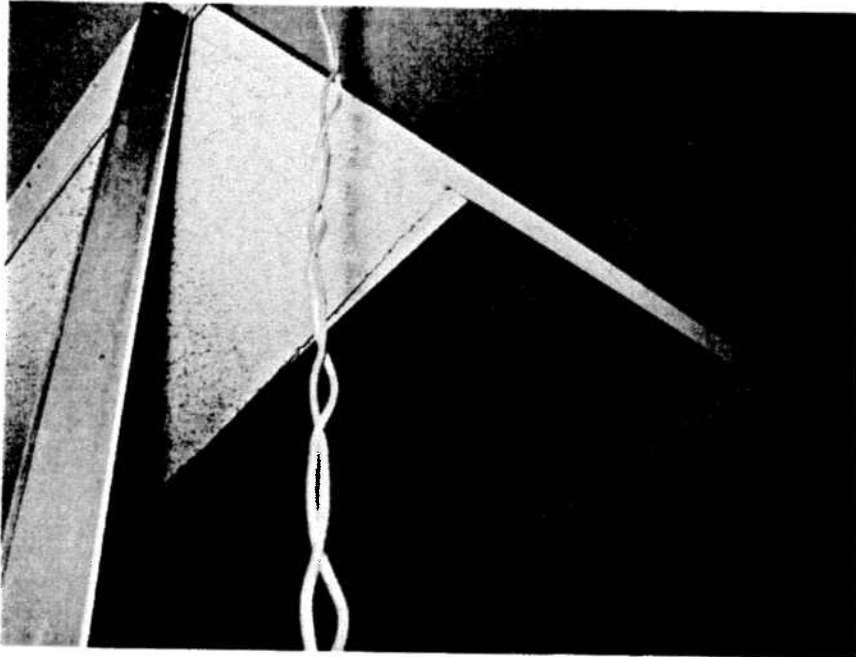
Second drop ceiling above current ceiling seen in “commo room” north of the kitchen.
